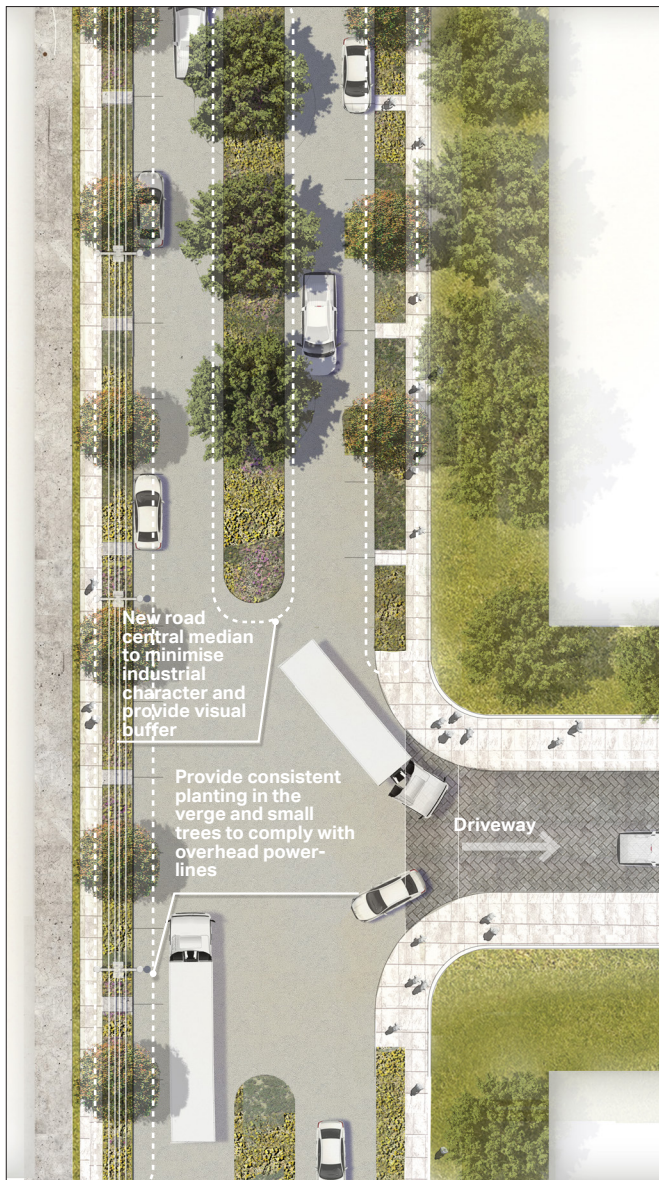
Streetscape Canopy Short Term Concept Plan (Source: AECOM, 2018)
